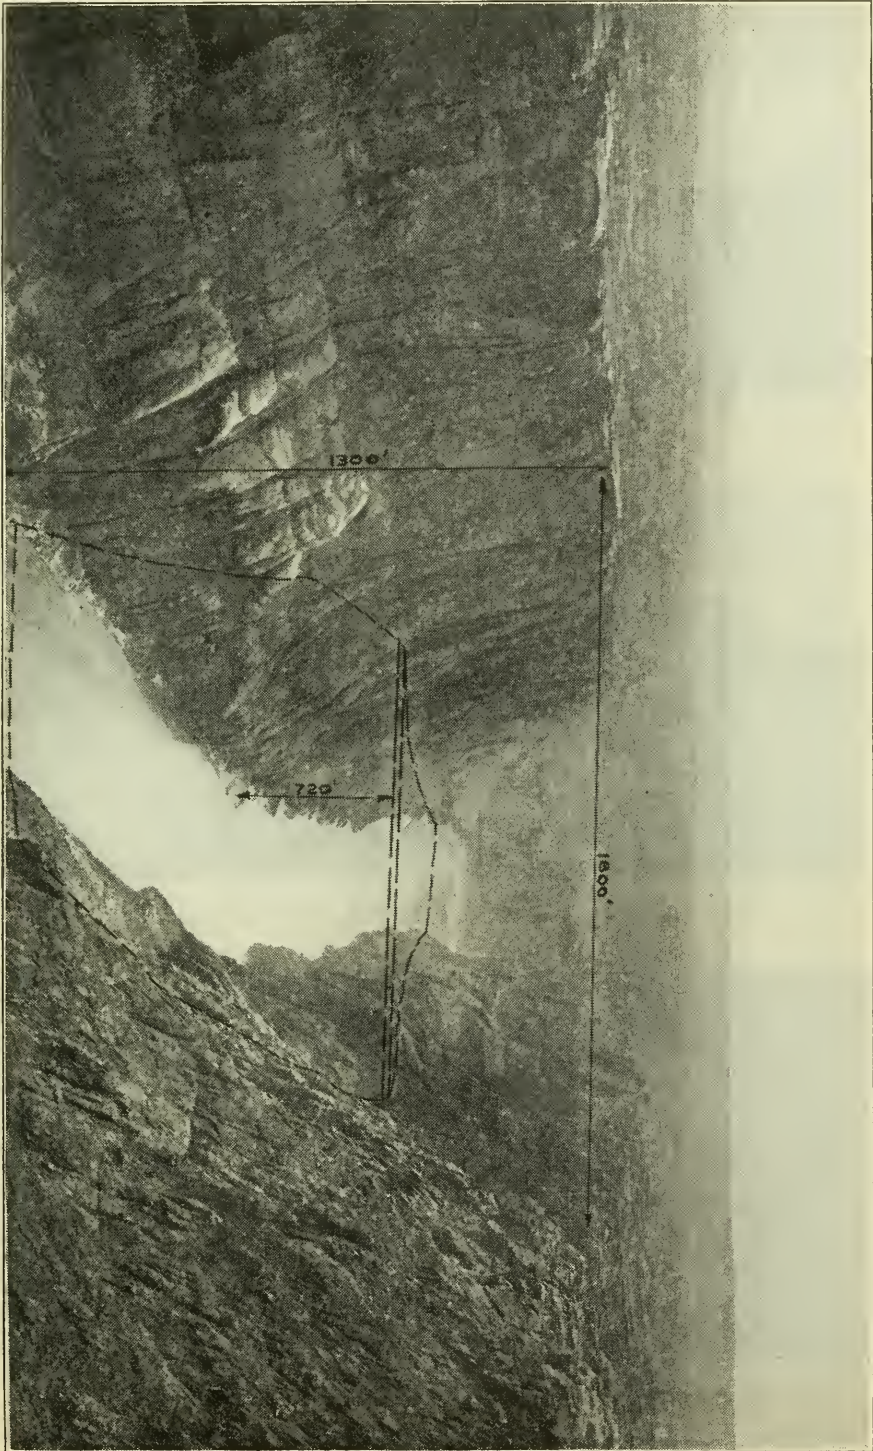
DOWN-STREAM VIEW OF DAM SITE AT LEE FERRY, ARIZ.
